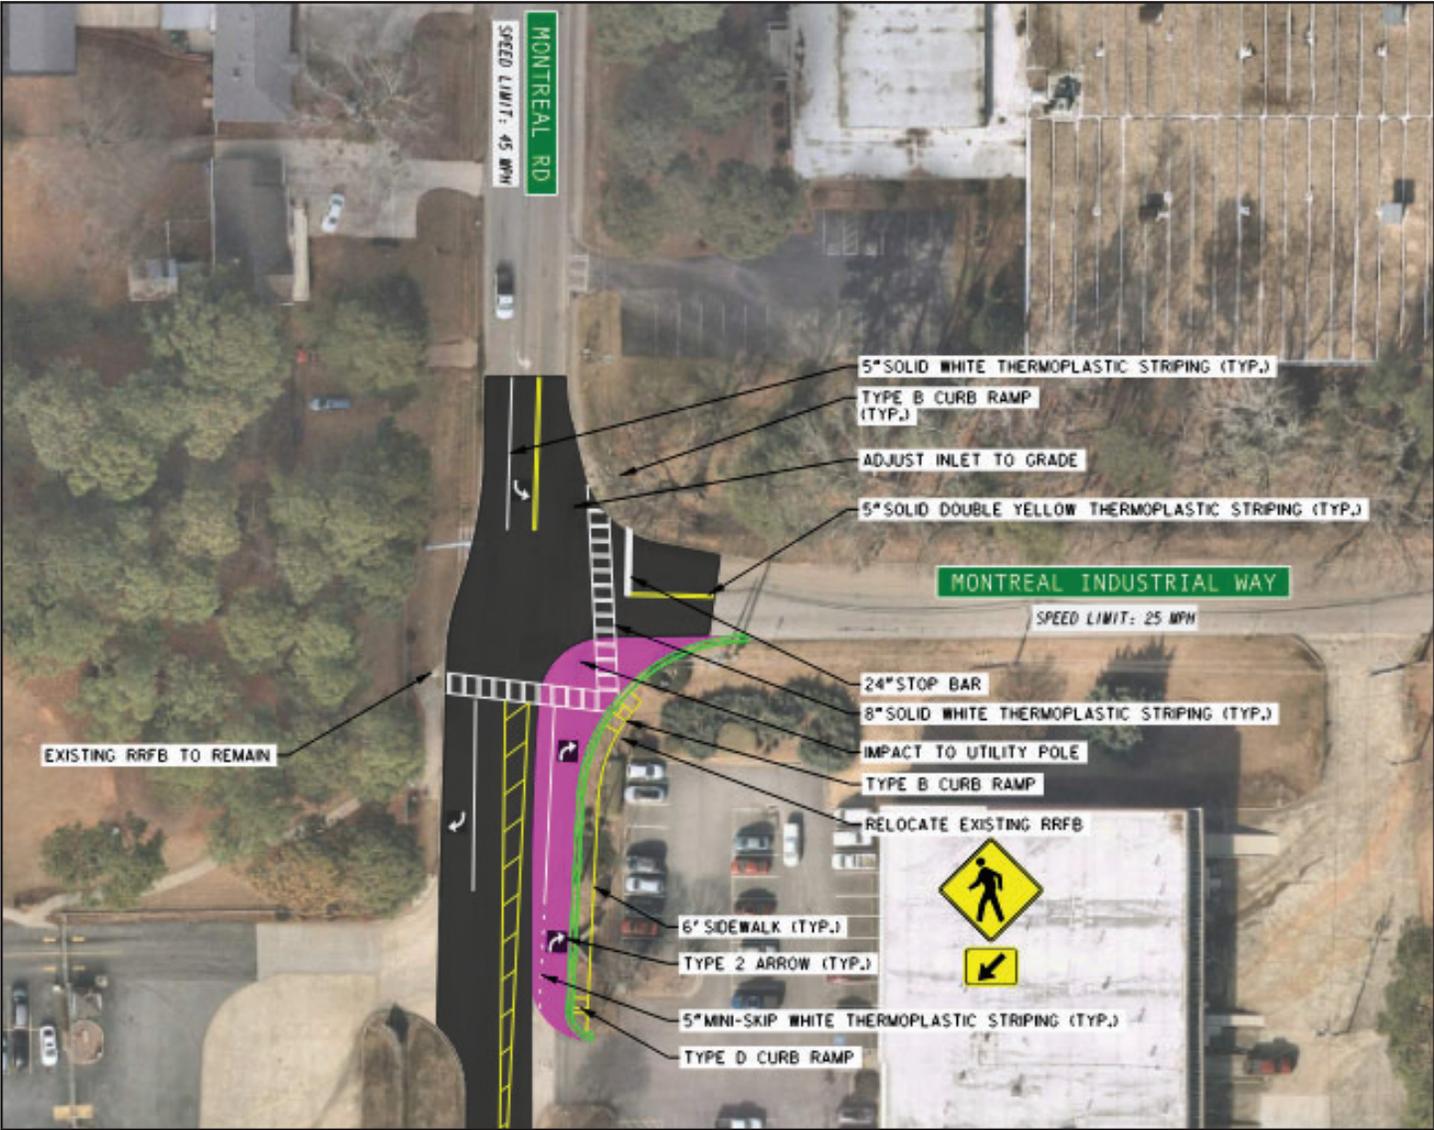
Project ID-027-028: Montreal Rd W at Montreal Ind Way Concept Drawing
